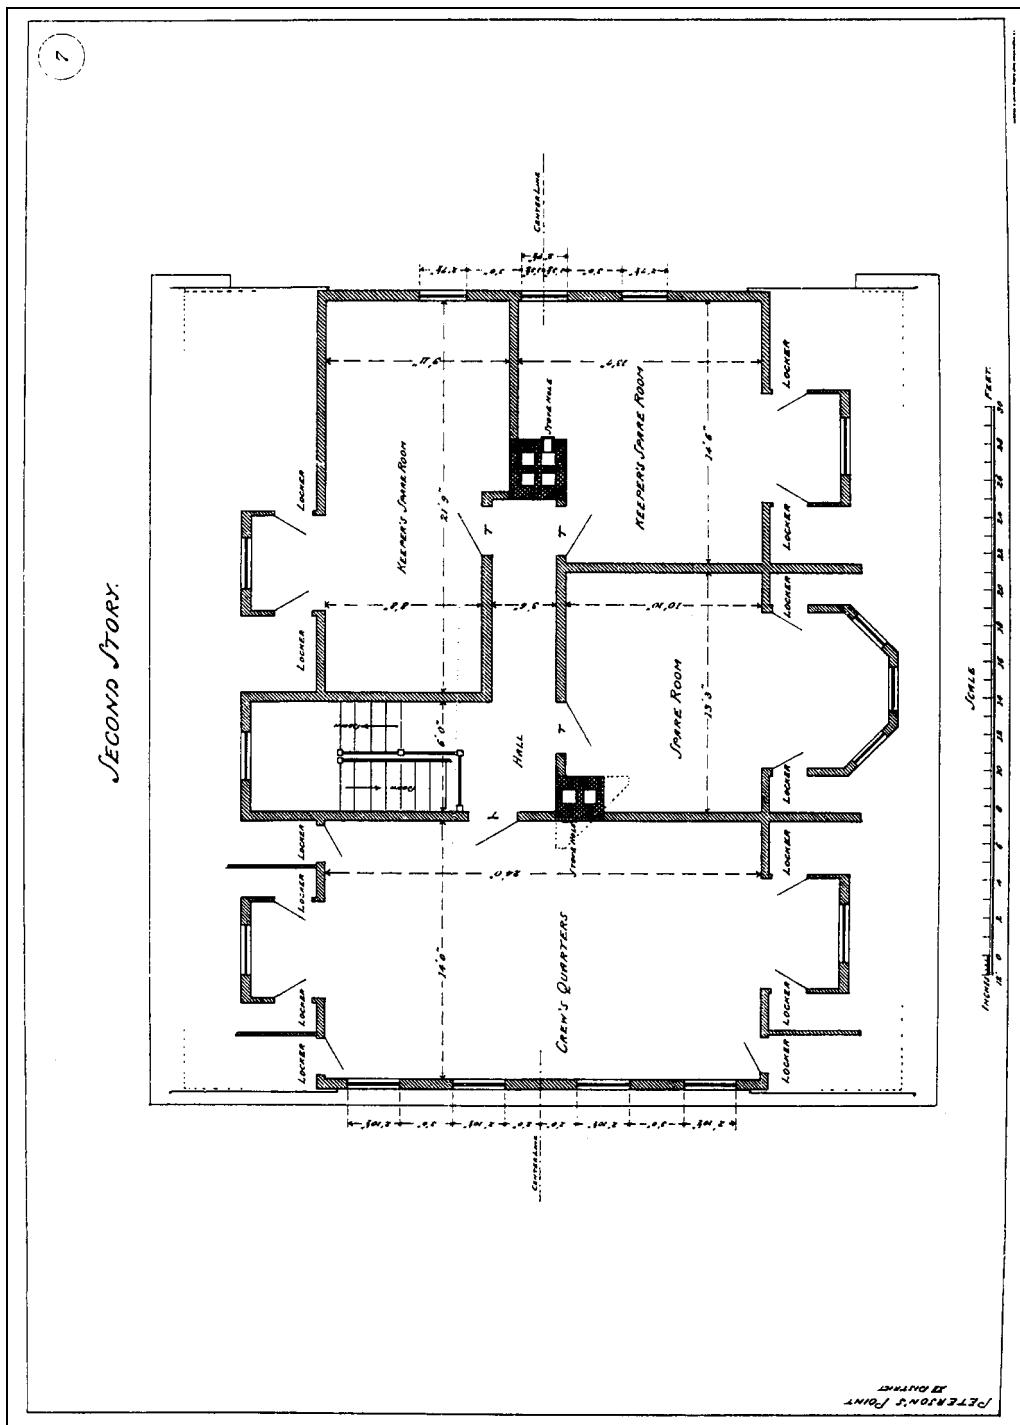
Second Floor Plan, Tillamook Bay Life-Saving Station. Source: Nautical Research Centre (#425).
